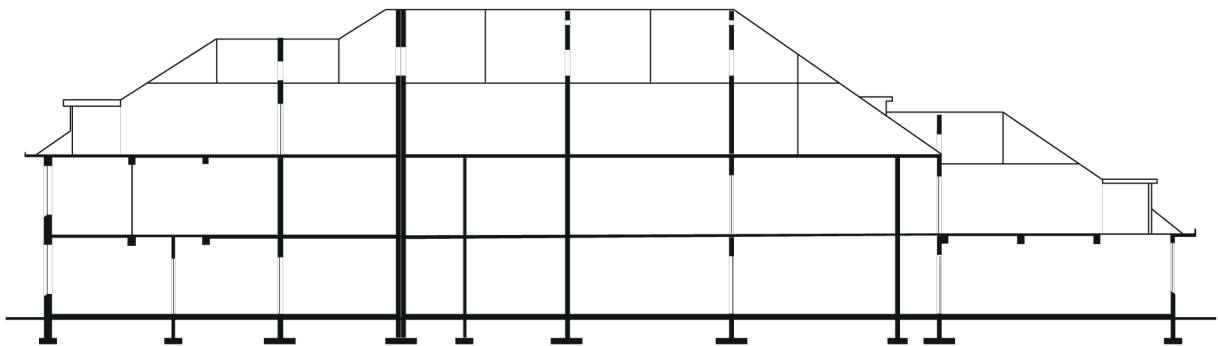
Typical 1930s construction method with brick construction walls and timber roof construction
